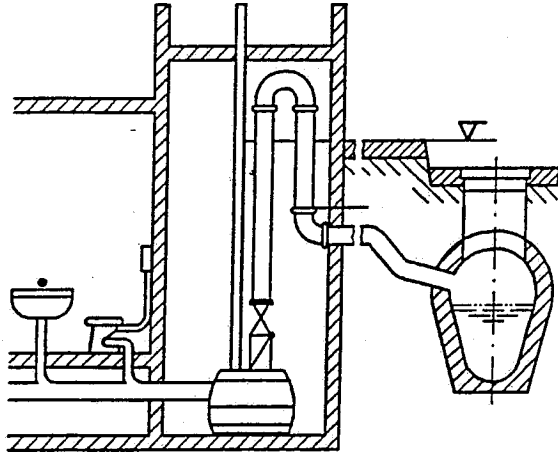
Illustration of protection against backflow where the drain or sewer is higher than the sanitary appliances
